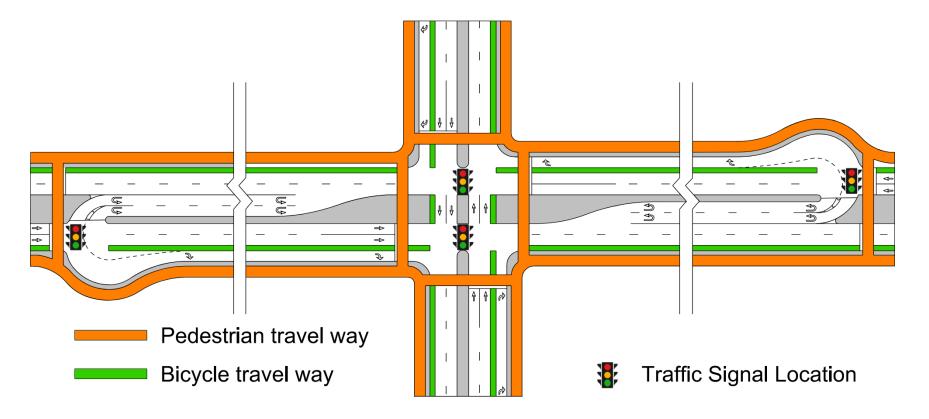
| MUT Intersection Pedestrian Crossing Locations and On-Street Bikeway Concept
